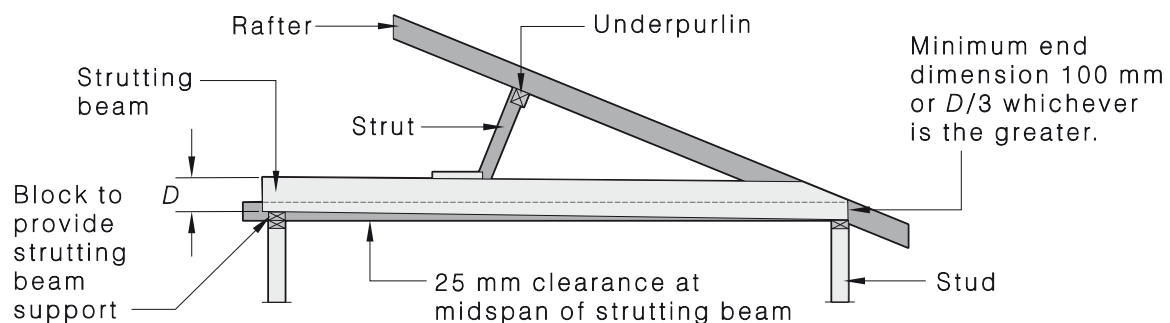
INSTALLATION OF STRUTTING BEAMS
